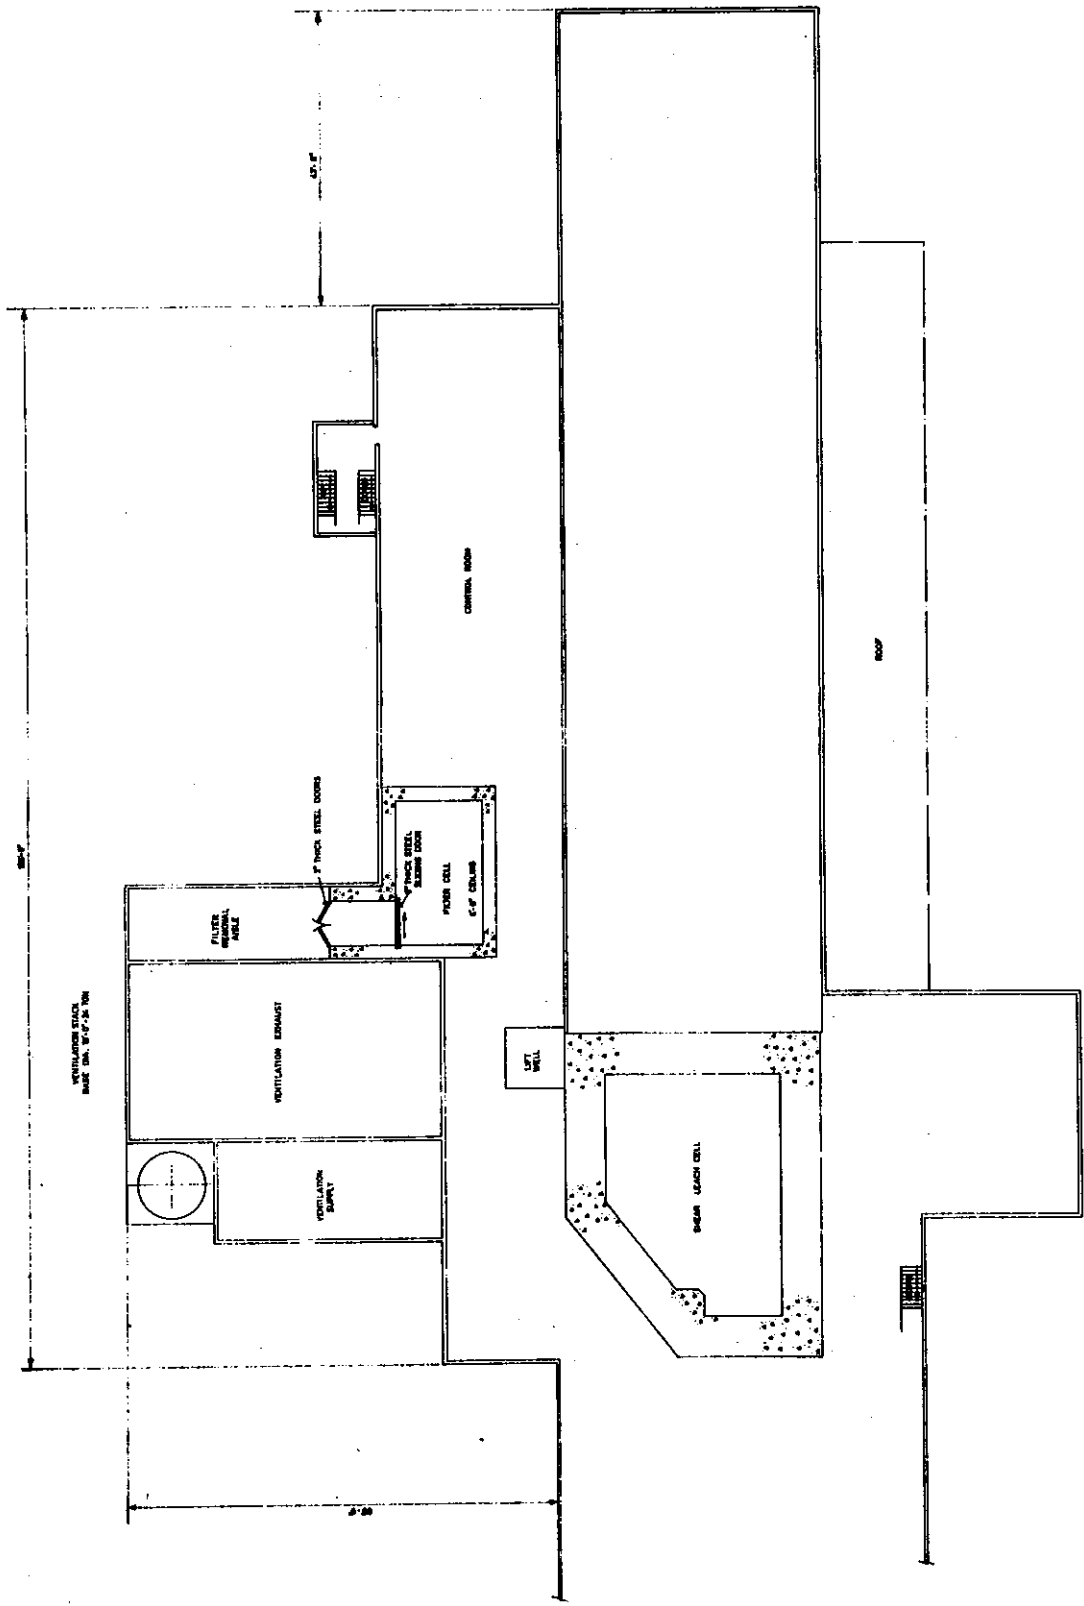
BUILDING DESIGN - PLAN 0 ft TO 20 ft
